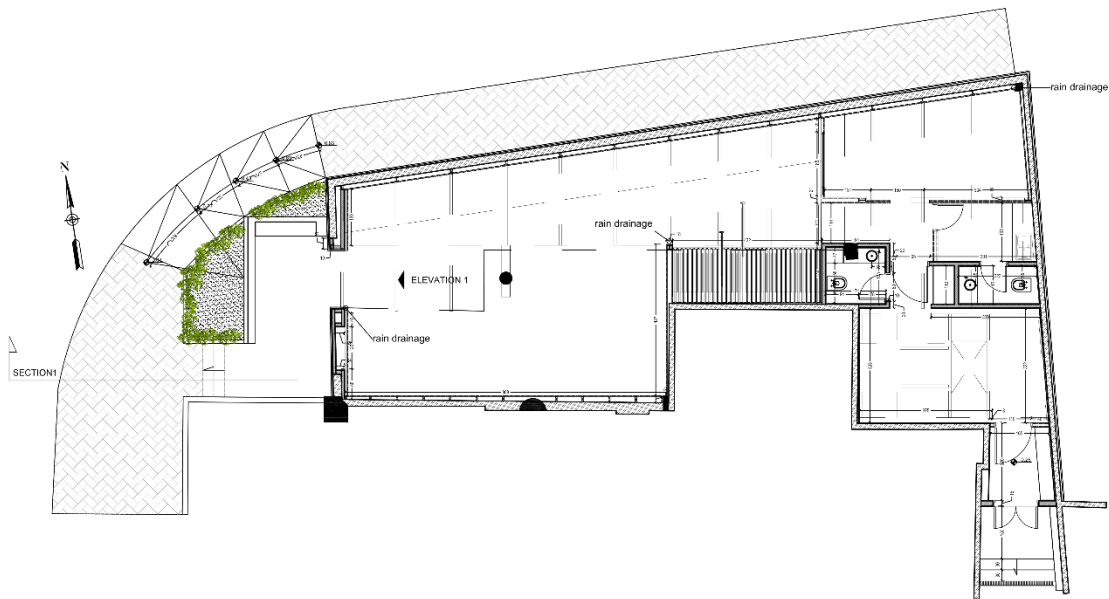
Plan of the New Space of Galerie Janine Rubeiz. Courtesy of Karim Bekdache Architects.
